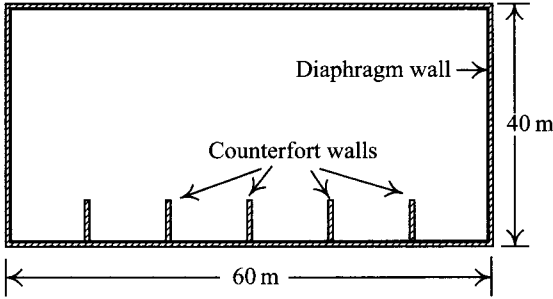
Arrangement of counterfort walls in a hypothetical excavation.
